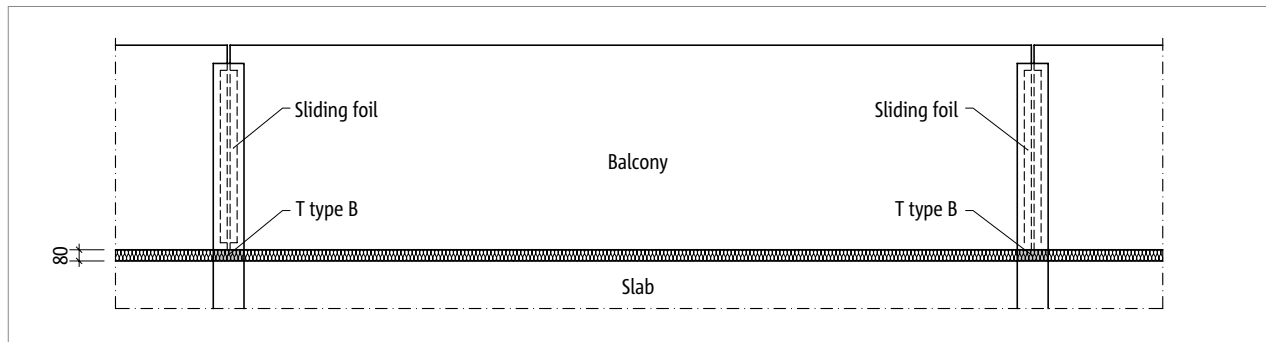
Schöck Isokorb® T type B: Layout; fatigue resistance due to the sliding foil between the balcony slab and cantilevered beams
